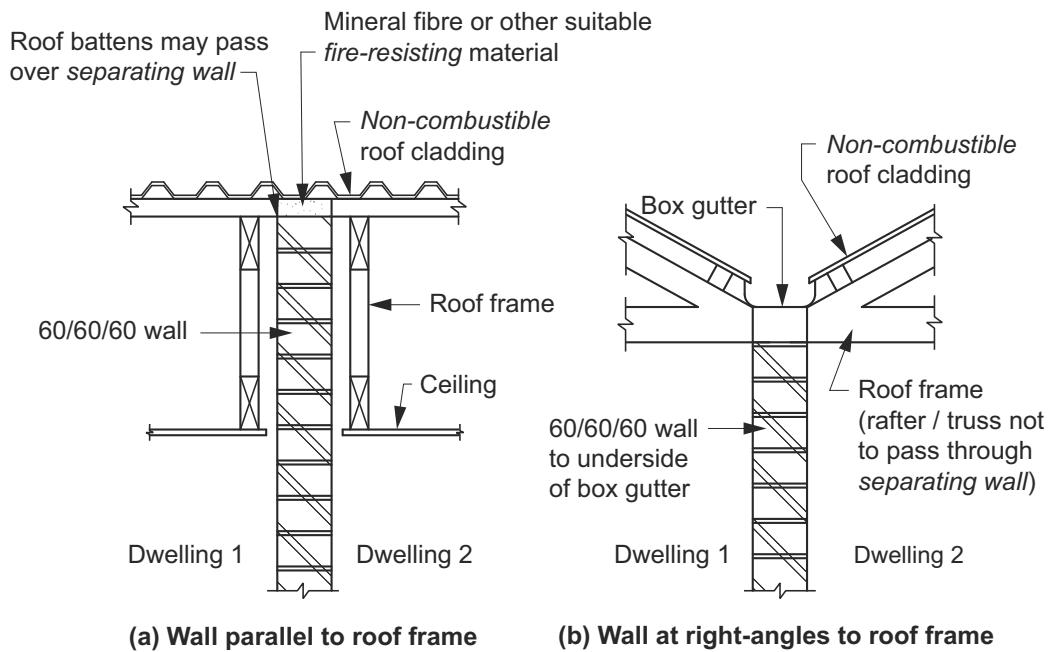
Separating wall construction — Underside of non-combustible roof cladding (diagram 2)
